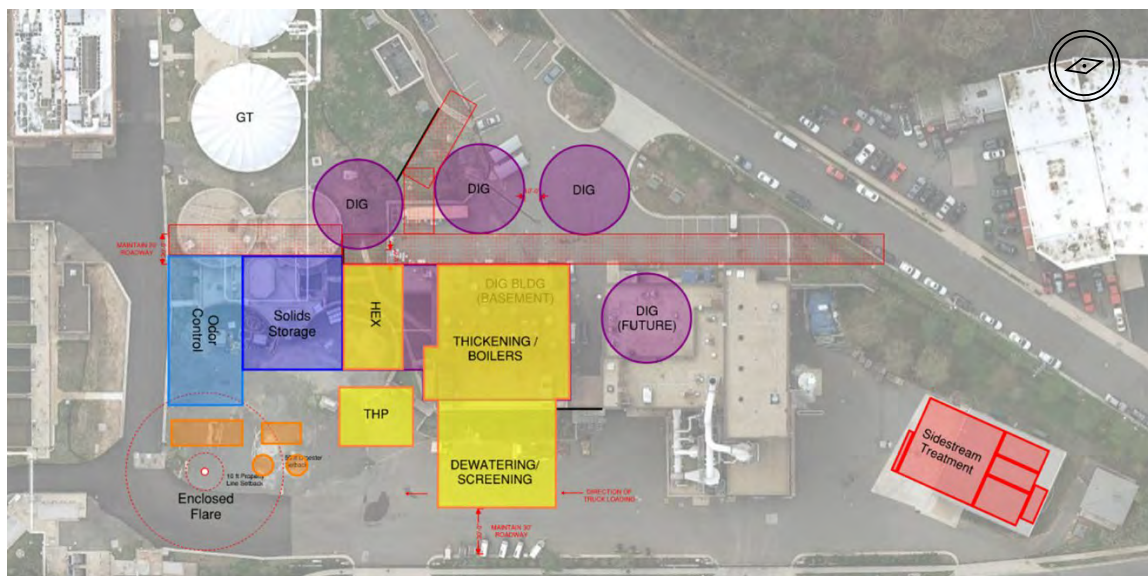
Decommission Existing Dewatering Building, Build New Dewatering Building
